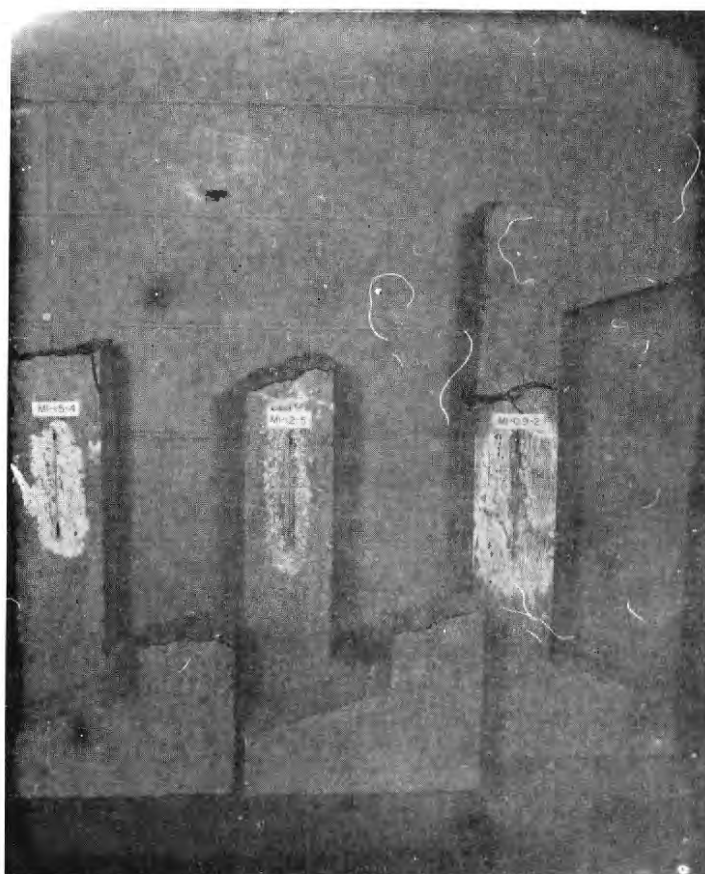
DETAILS OF TYPICAL TENSION FAILURES
